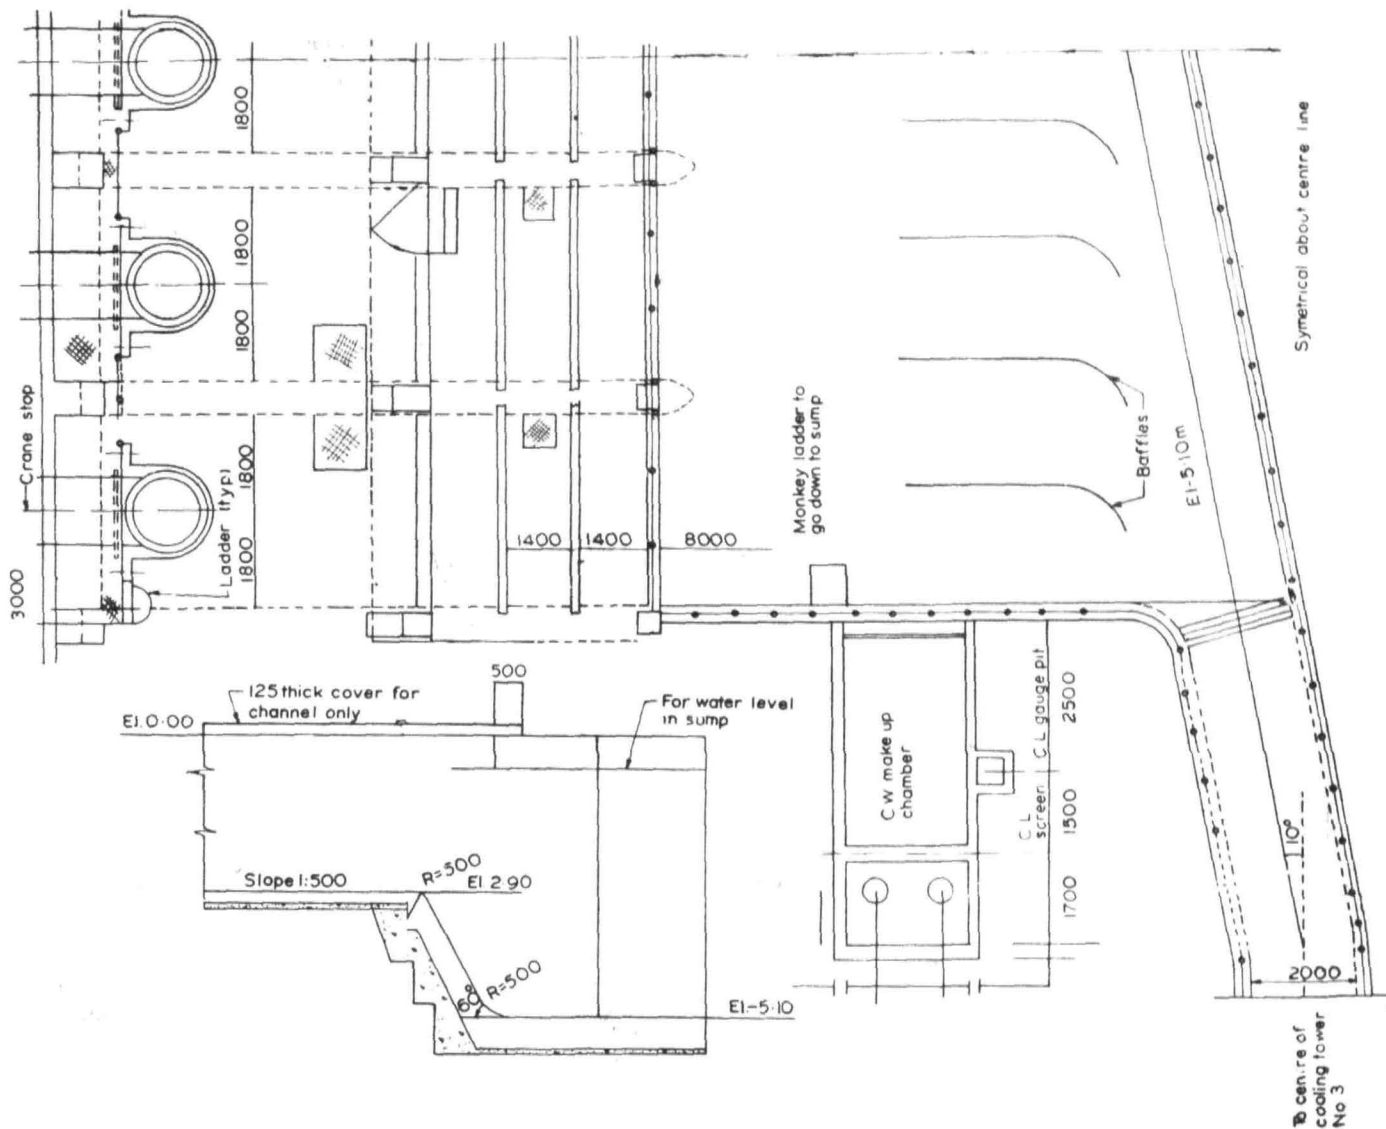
Layout of sump-pump house for extension units III & IV—Guru Nanak Thermal Plant, Bhatinda (T.C. Engrs.).
